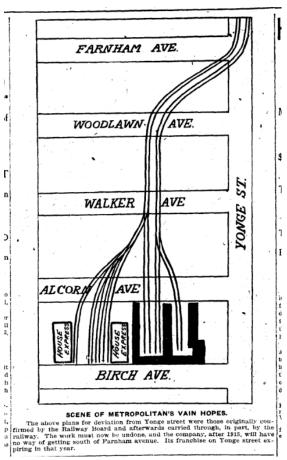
1913 Newspaper article sketch showing T&YRR's planned track deviation off of Yonge Street to a right-of-way just west and terminating at proposed new terminal buildings on the north side of Birch Avenue (never realized). (Toronto Star)
